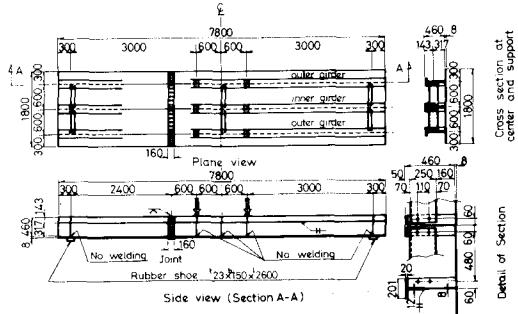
Dimensions and loading arrangement on steel girder specimen
